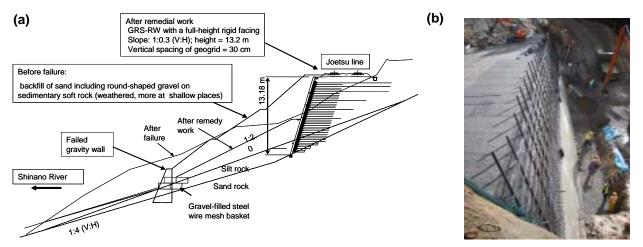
Site 2: (a) cross-sections before and after failure and after reconstruction of the railway embankment (photo courtesy of East Japan Railway Company); and (b) reconstruction of a GRS retaining wall with a full-height rigid facing (the bottom half of wall completed, 5 December 2004, photo taken by F. Tatsuoka).
